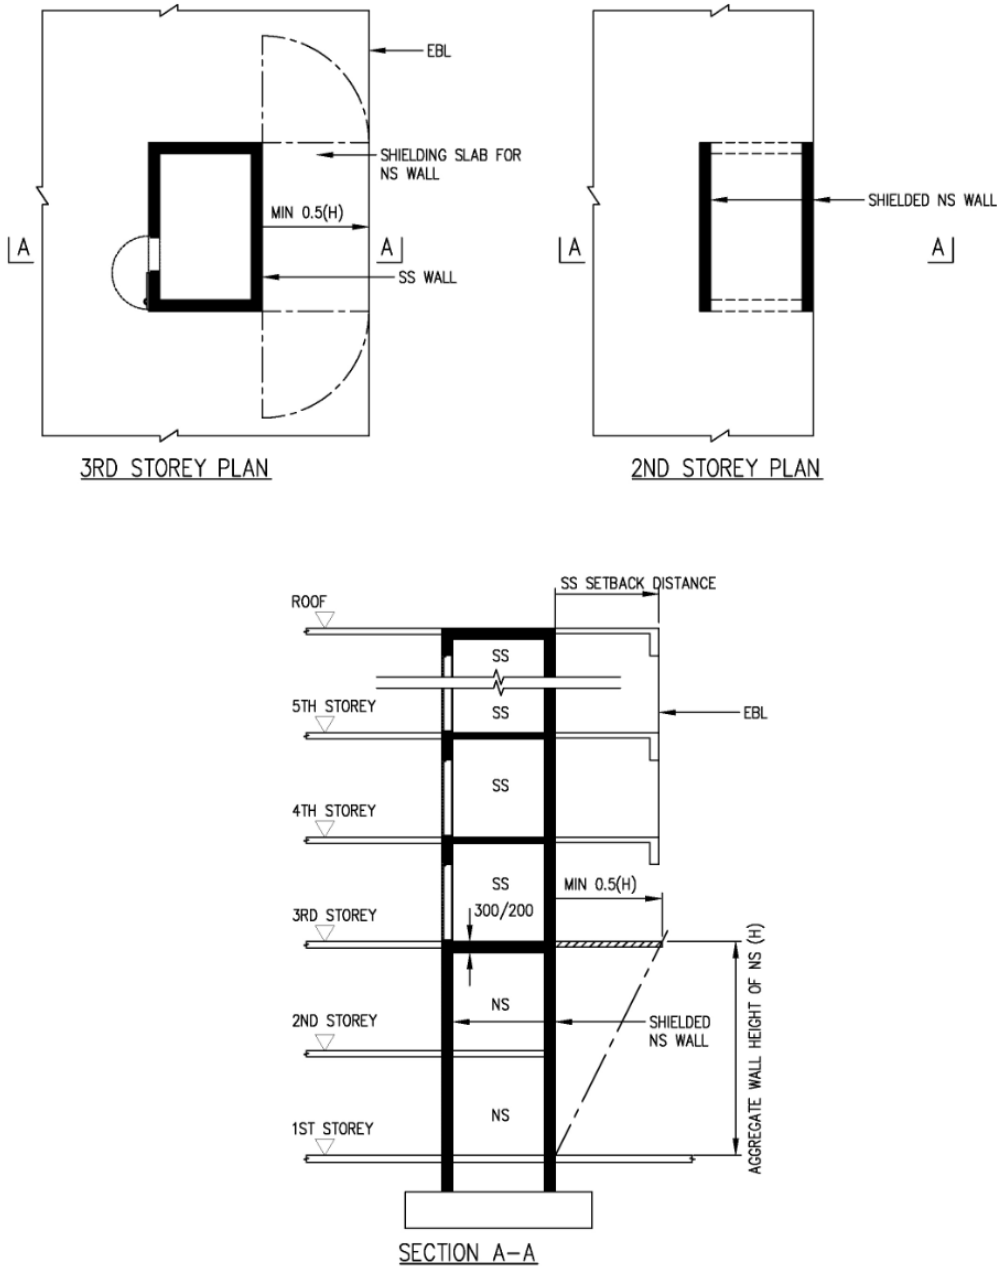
A : SHIELDED NS WALLS OF SS TOWER
